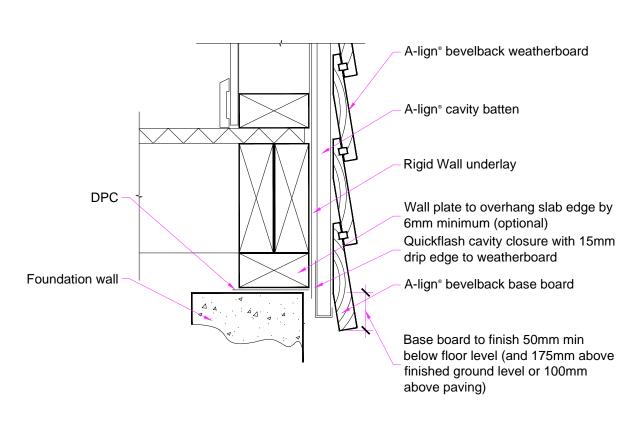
A-lign® bevelback weatherboard - cavity - base of wall - timber floor Scale 1:5
